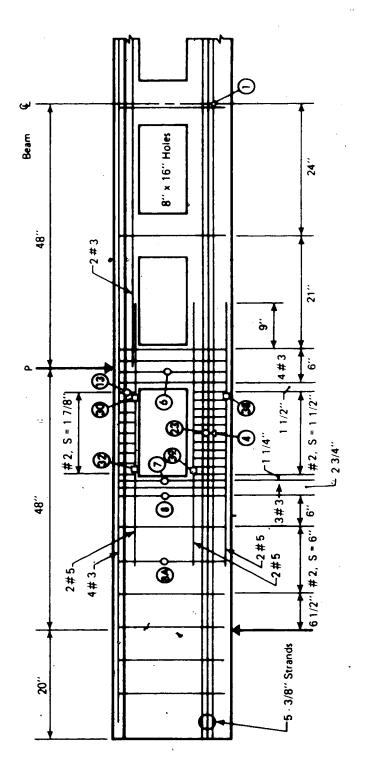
Reinforcement Details and Strain Gage Locations for Beam 23-16-4
